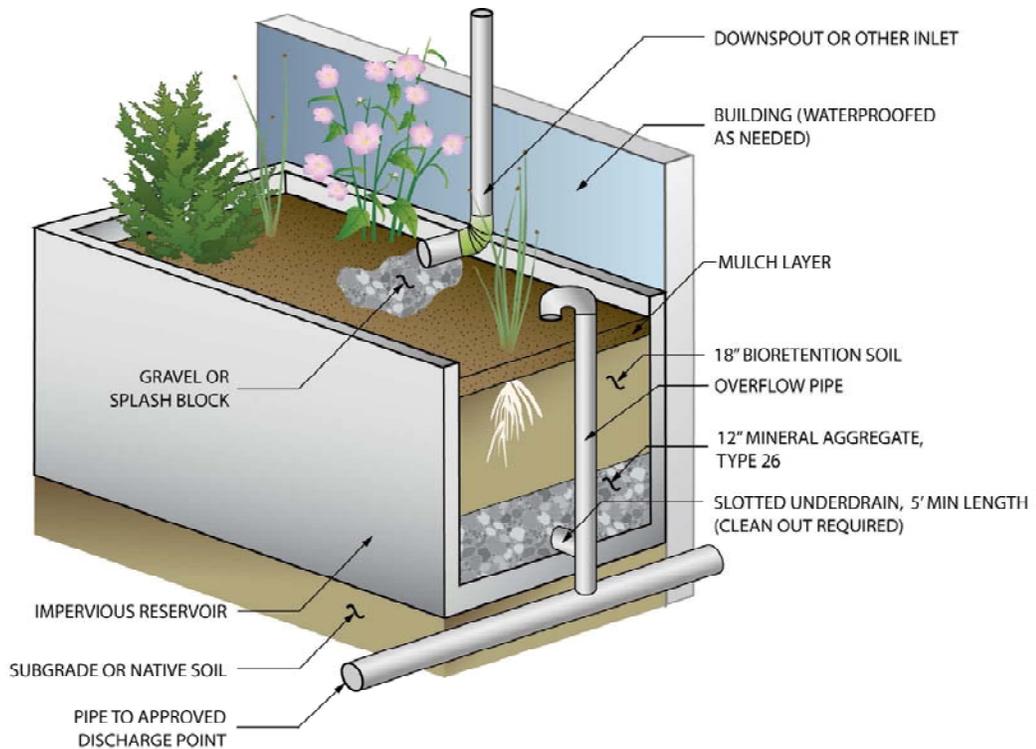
Typical cross-section of a bioretention planter (City of Seattle)
